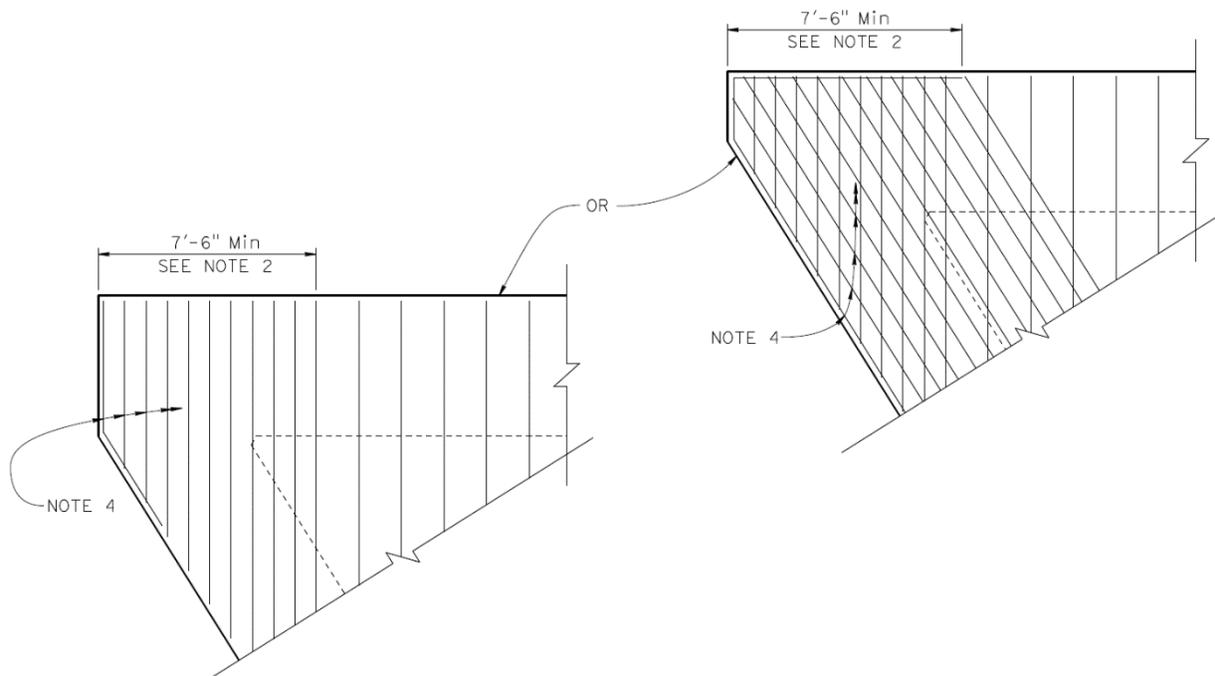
Skewed Deck Corner Reinforcement (Over 20° Skews)
